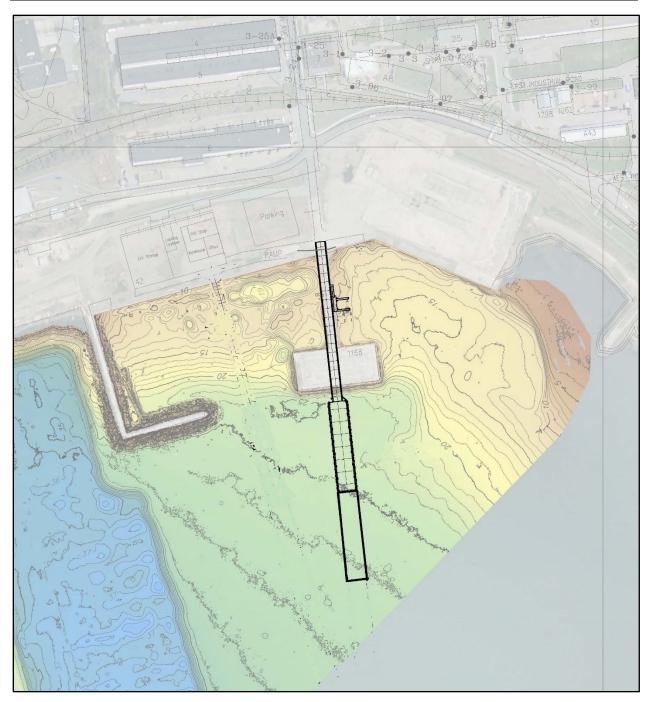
Plan View of Existing and Proposed Waterfront Facilities (Action Alternative)
